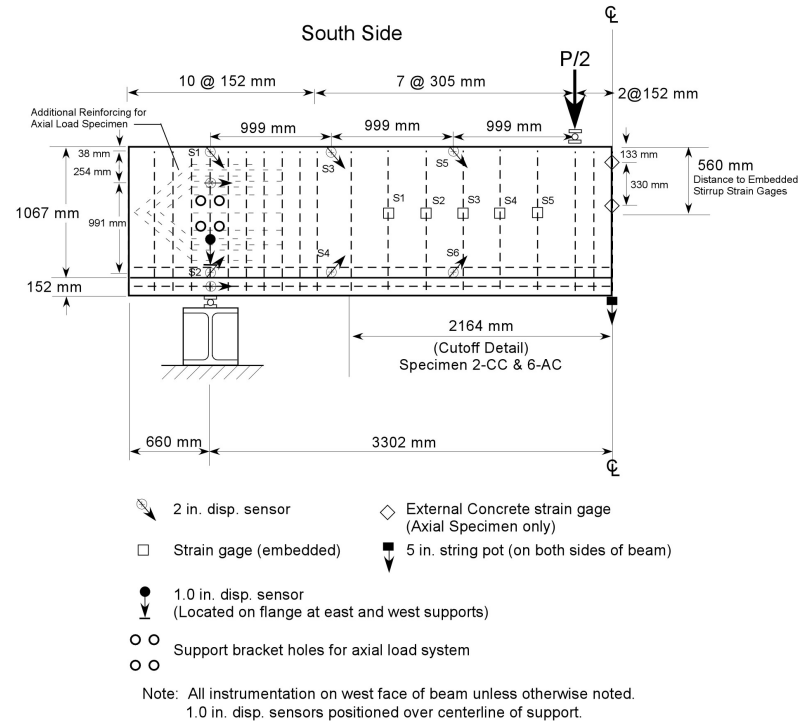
Specimen reinforcing details and typical instrumentation placement.
